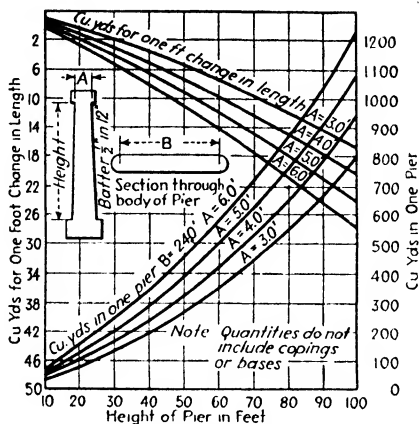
Quantities in Highway Bridge Piers Having a Batter of $\frac{1}{2}$ in. in 12 in.
